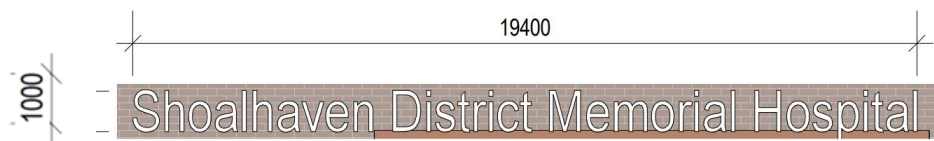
Proposed building identification signage – Shoalhaven Street (east elevation) (Conrad Gargett)
